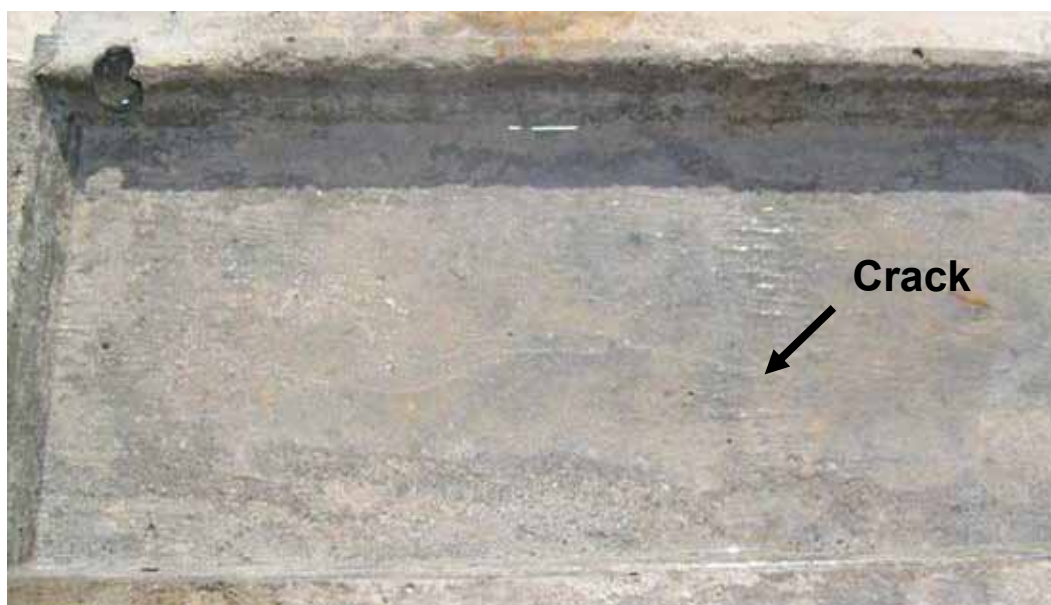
Photo. Crack propagation in specimen ECR-2h-V-1.
